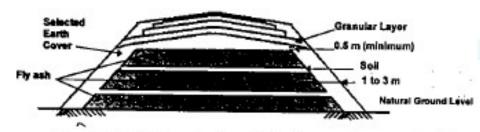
Typical Cross-Section of Embankment with Alternate Layer of Fly Ash and Soil
